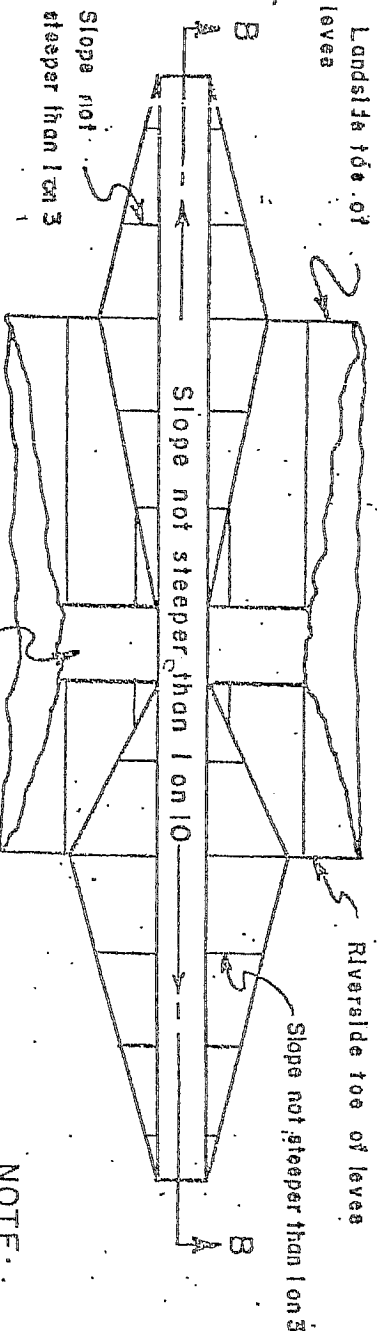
EXHIBIT "A"                      EASEMENT NO. DACW29-2-15-38
